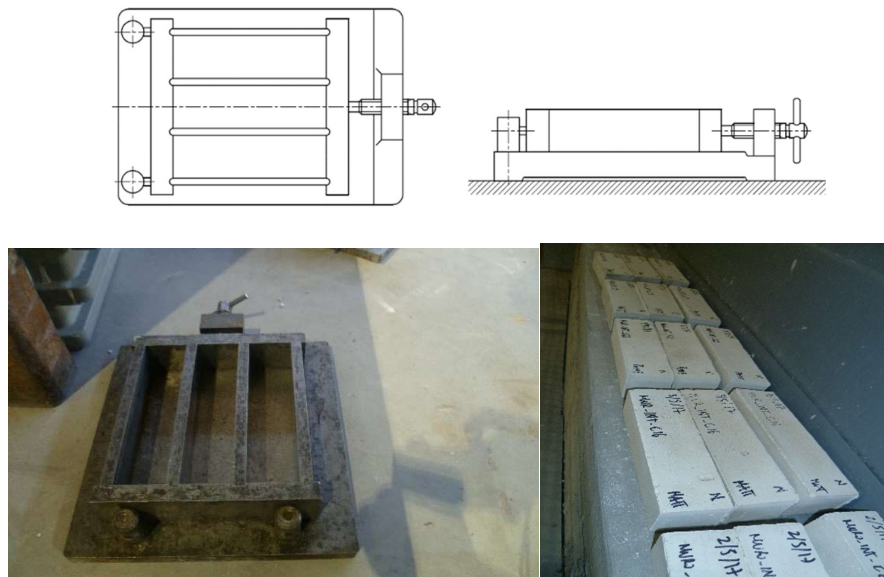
1: Mould used for casting the specimens and resulting mortar specimens.
